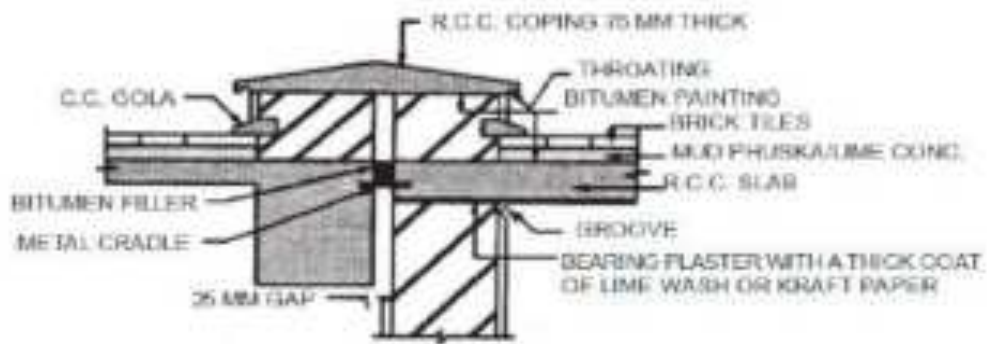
Typical Details of Expansion Joint at Wall & Beam Junction
